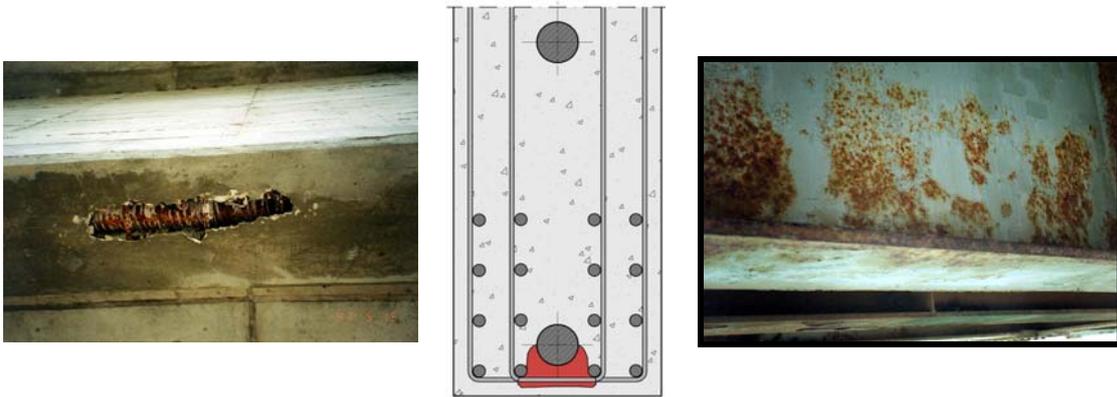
Concrete defects in prestressed girders and corrosion in main steel beams of the cable stayed bridge
